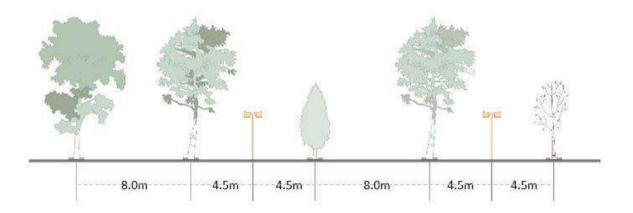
Green Furnishing Spacing Guidelines (Dhaka Structure Plan 2016-2035, 2016)
